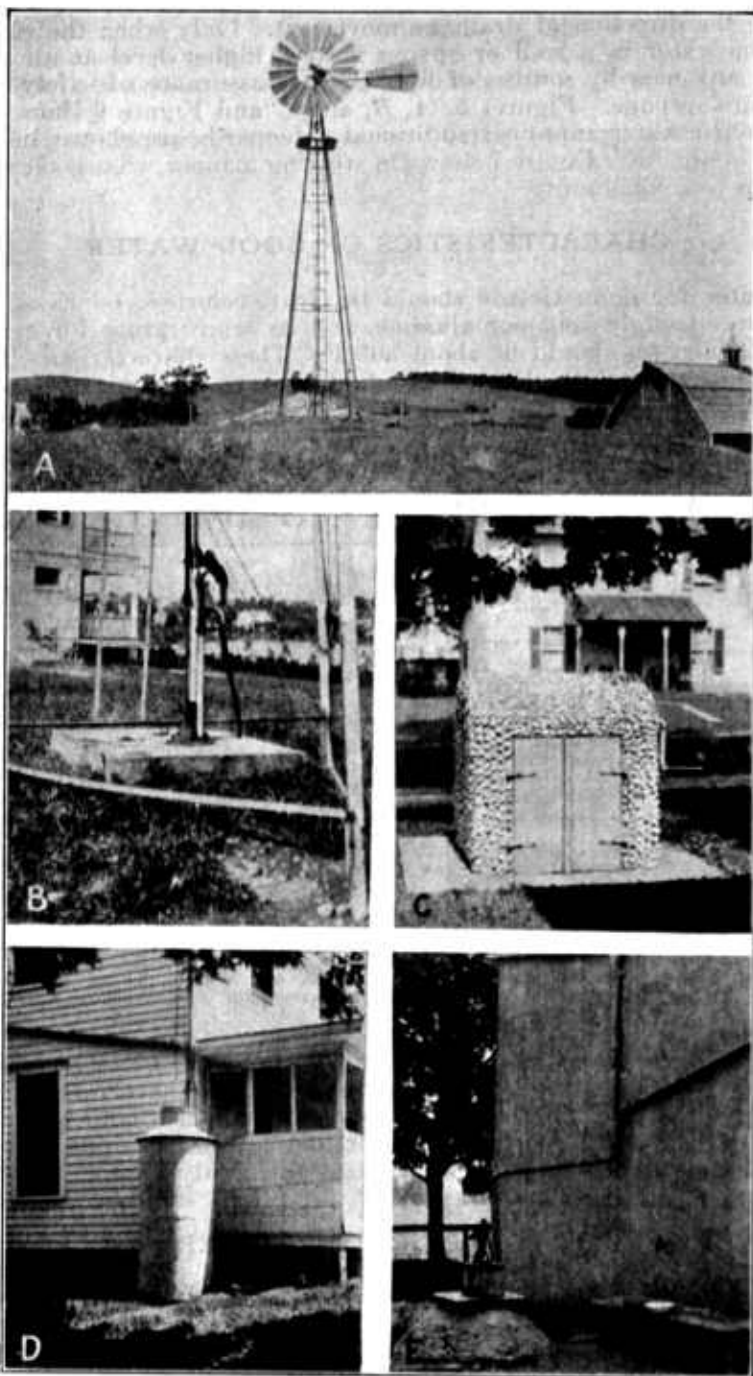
A, Favorable location for well; clean ground above or to one side of impure drainage from buildings; B, tight concrete platform with raised and sloping top and pump securely bolted to it; C, protection of an old well, Maryland; D, galvanized steel cistern objectional because the water dissolves more or less zinc, is warm in summer and freezes in winter; E, loose rubble masonry cistern; water liable to pollution from surface wash and underground seepage.
